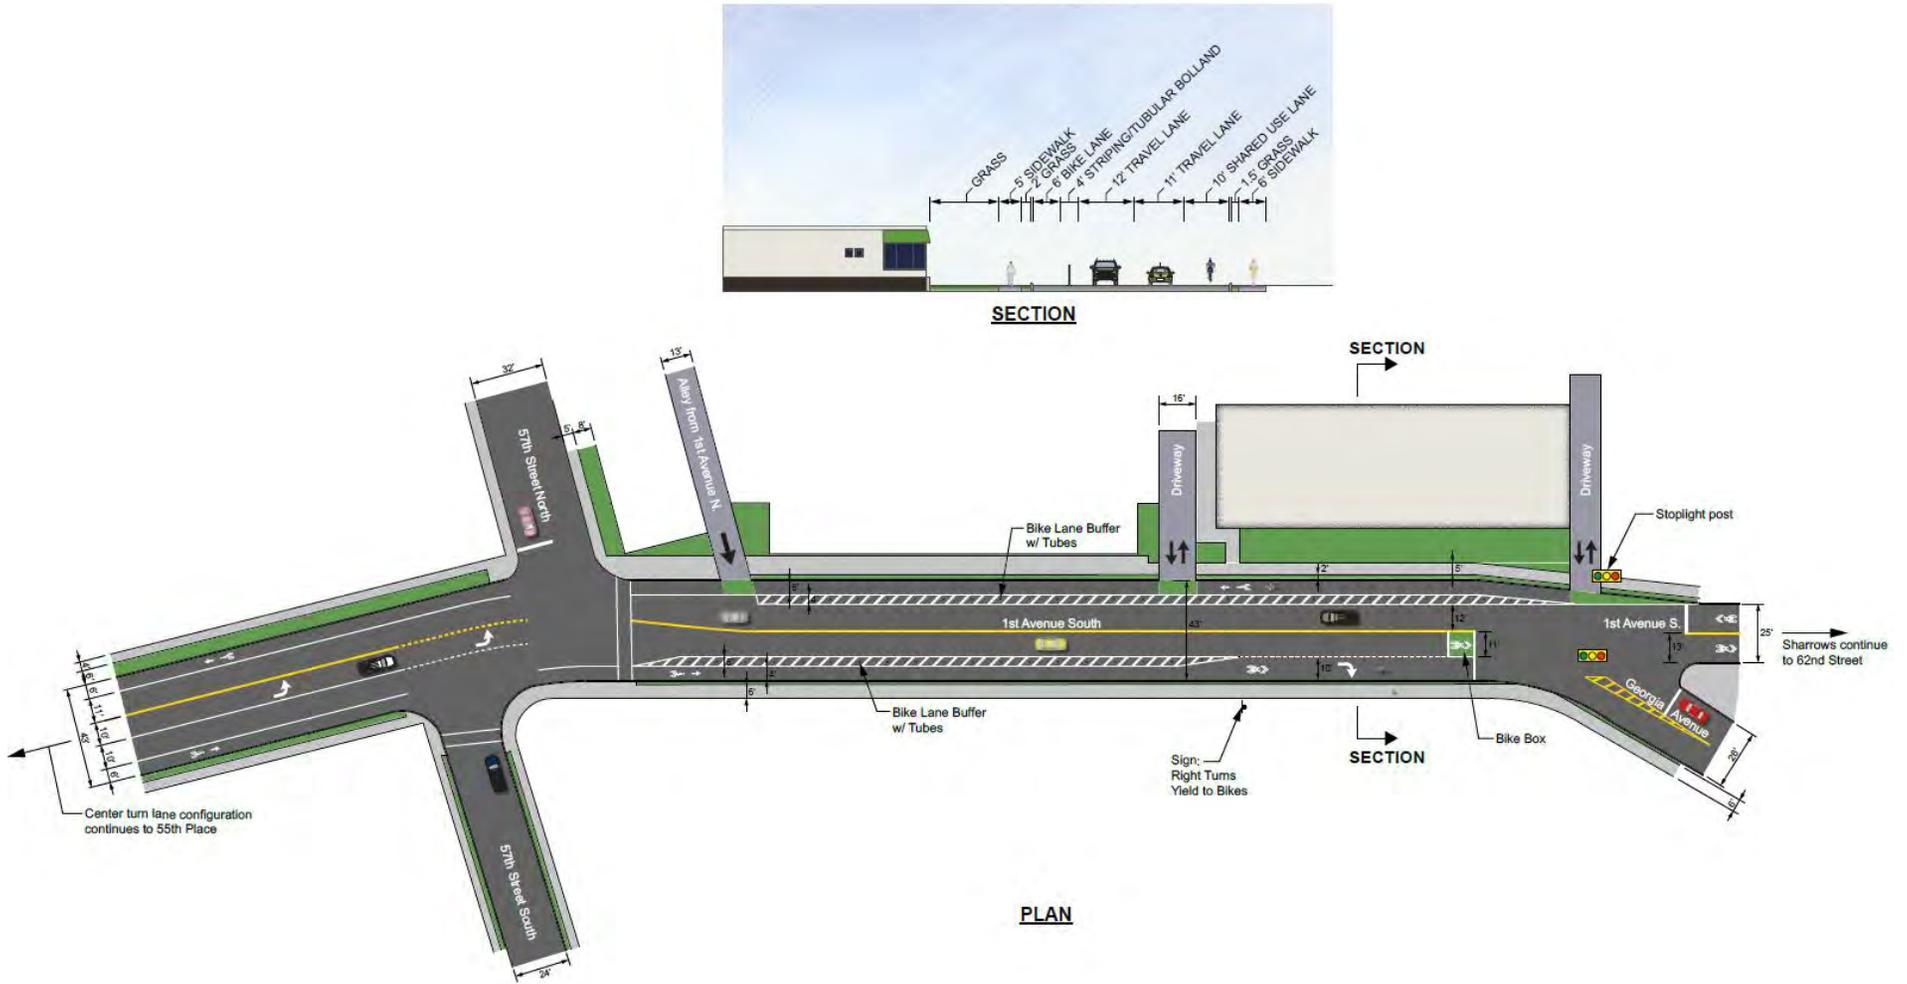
1st Avenue S. at I-20 Overpass (North Side)
